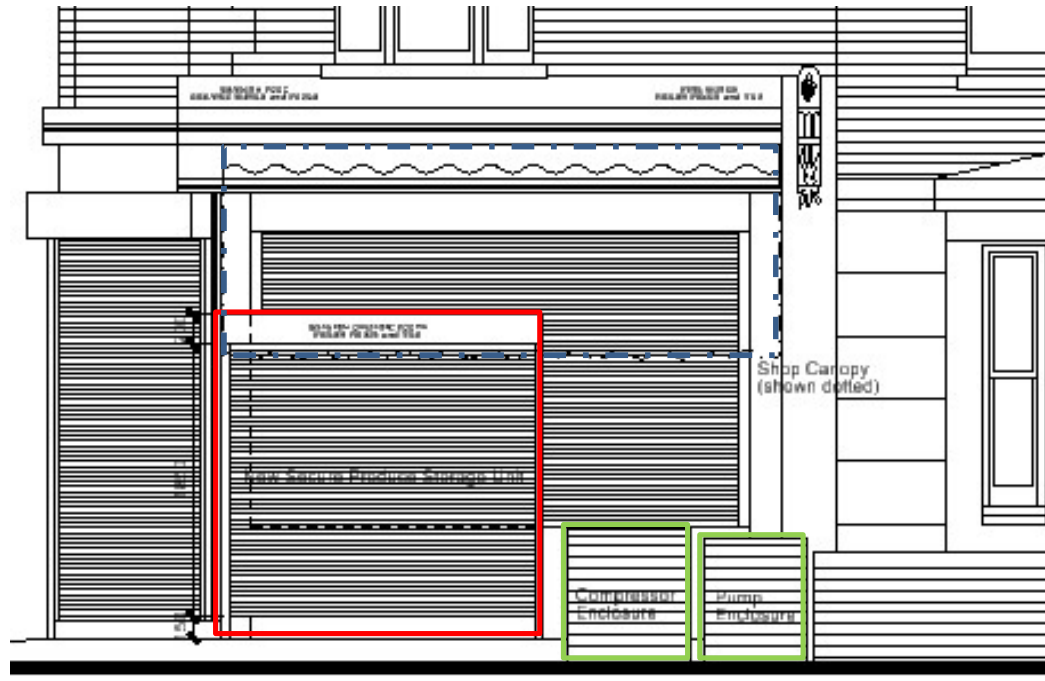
Drawing showing elevation of proposed storage unit (outlined in red) with existing enclosures which are to remain (outlined in green) and shop canopy (outlined in blue)
